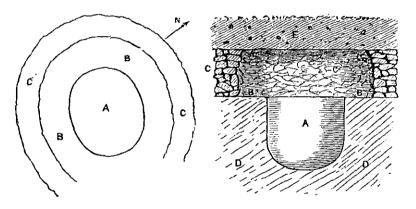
Ground-plan.Fig. 2.--Section.Figs. 1 and 2.-Ancient Building, with excavations in the rock, discovered at
